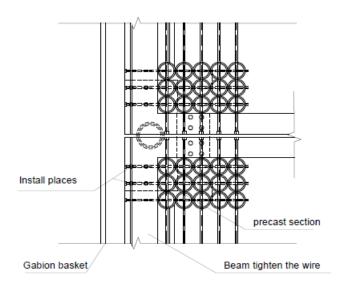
Precast slab from pipes, plan X-X. Source: Designed and drawn by the author
